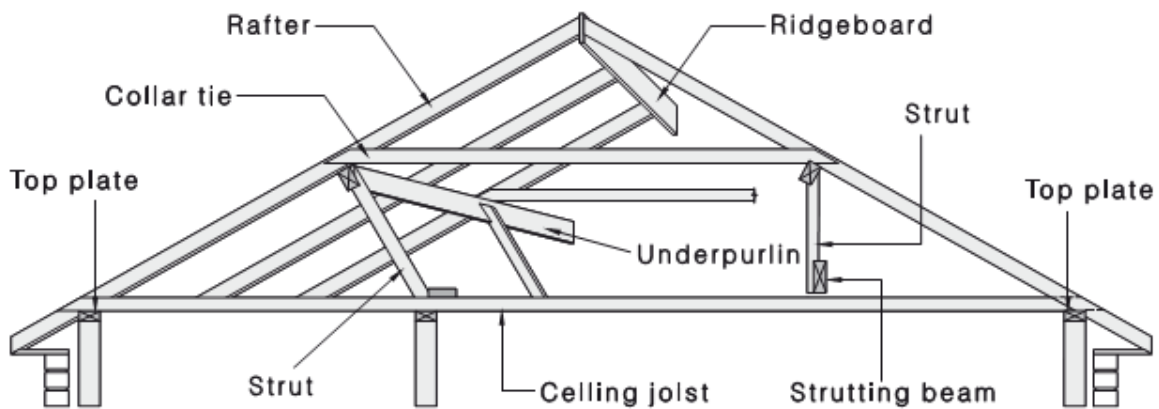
Arrangement for typical pitch frame construction (Source: AS1684.3)
